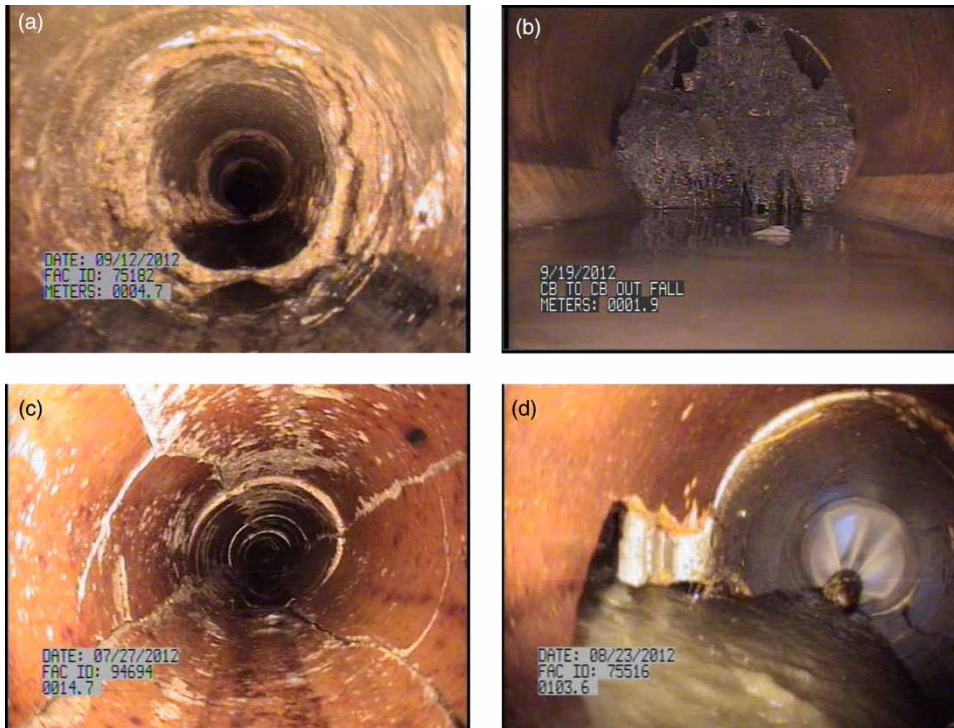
| Pipe defects inside a sewer mainline: (a) hole in pipe; (b) roots mass; (c) deformed pipe, multiple fractures, surface damage; (d) broken pipe with pieces missing (with permission from Navab 2014).
